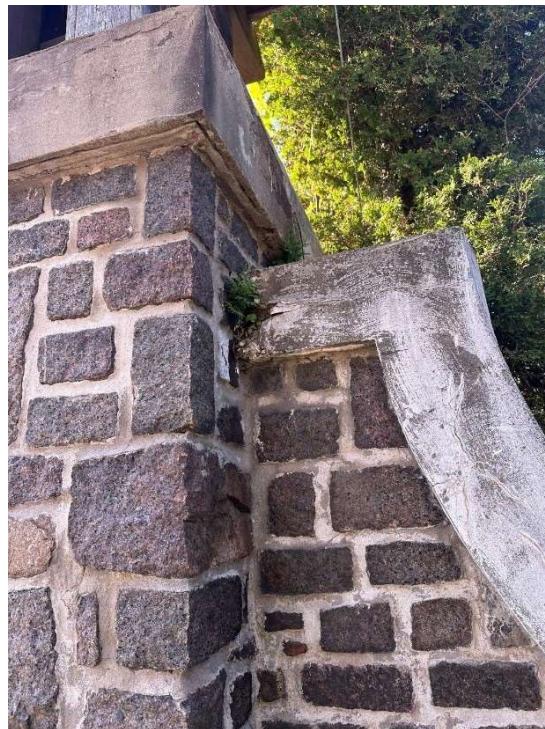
Vegetation growing from wing wall cap - West side, North gate
